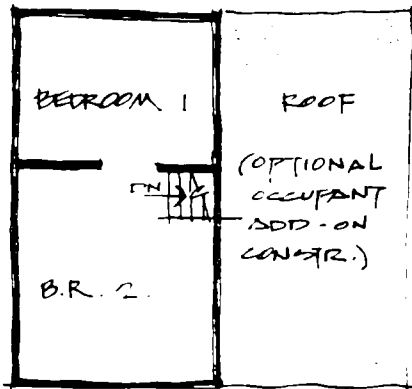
PA: Plans and Section of Typical Unit at Palo Alto
